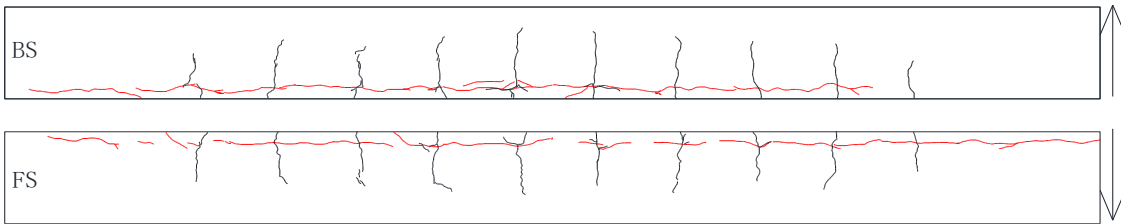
Cracking situation on C4 beam at 29 months
